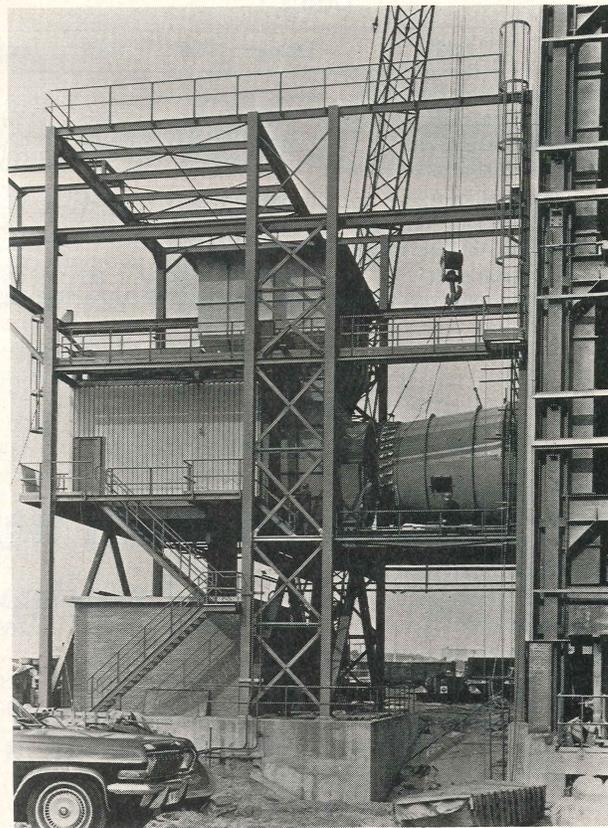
Single-stage mechanical draft axial fan used for forced draft service with sound attenuator installed
